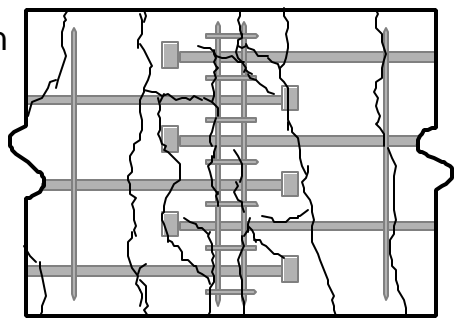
Crack development in the transverse stirrup cage test (specimen LS-08-04.04-12-10(N)-1-TTD)
